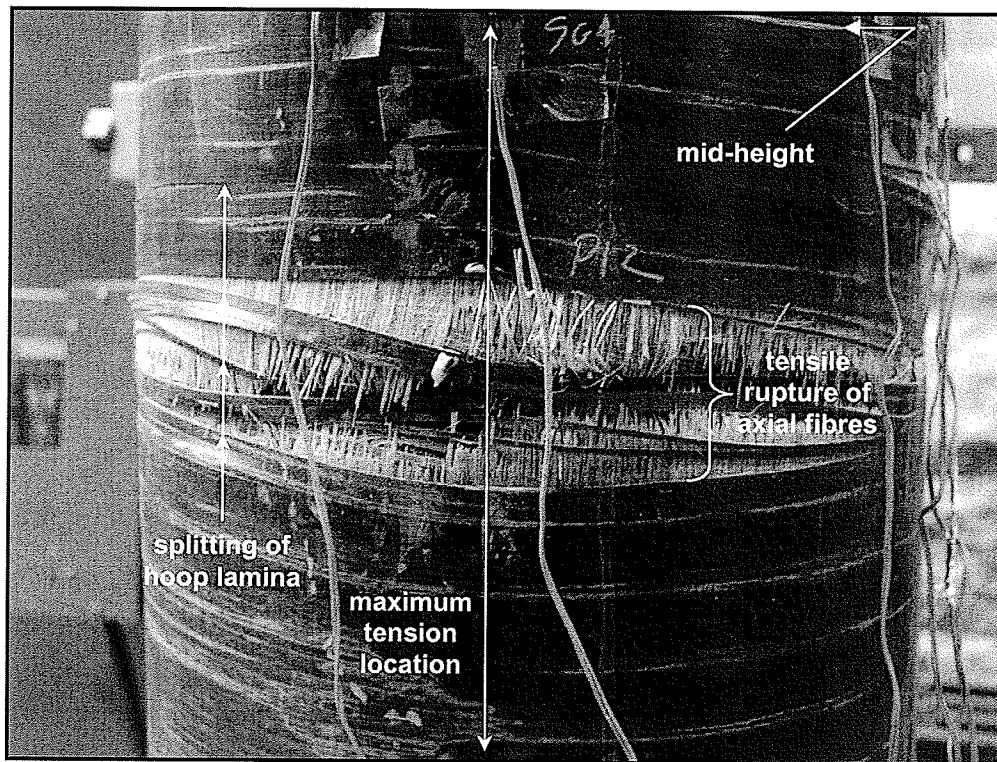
FRP shell tension failure on specimen BC-E-e100.
